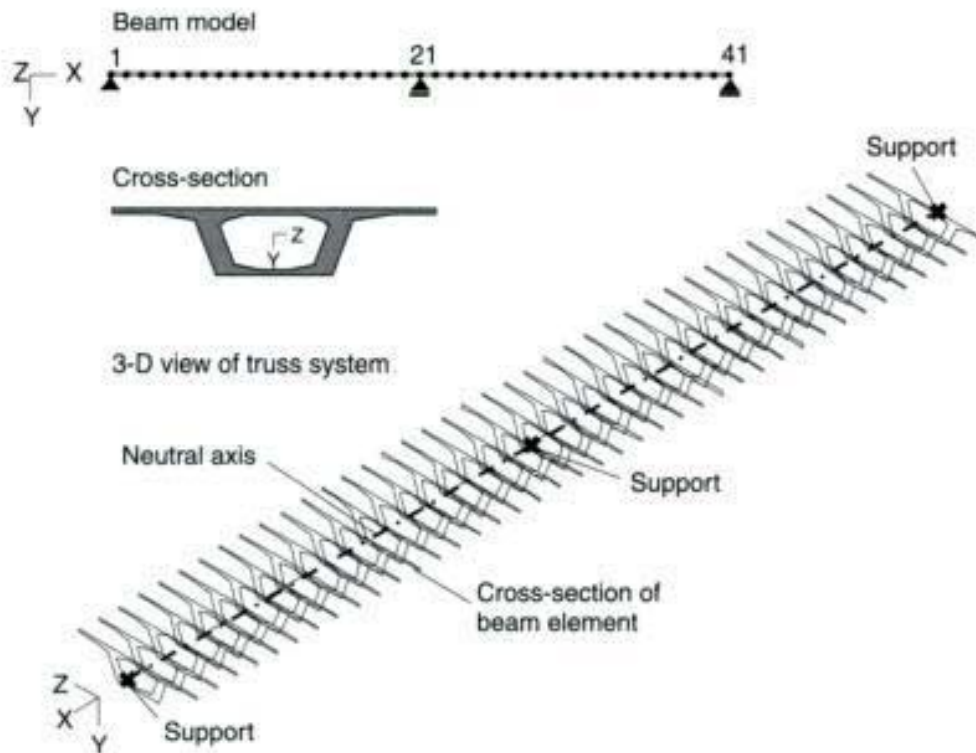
Numerical model of a two-span hollow box girder bridge
